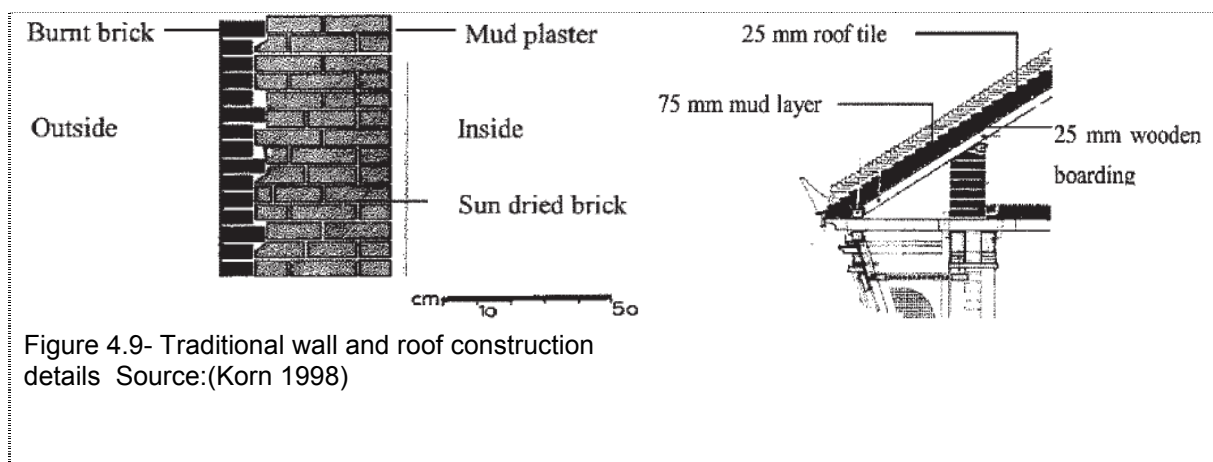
Traditional wall and roof construction details Source:(Korn 1998)
